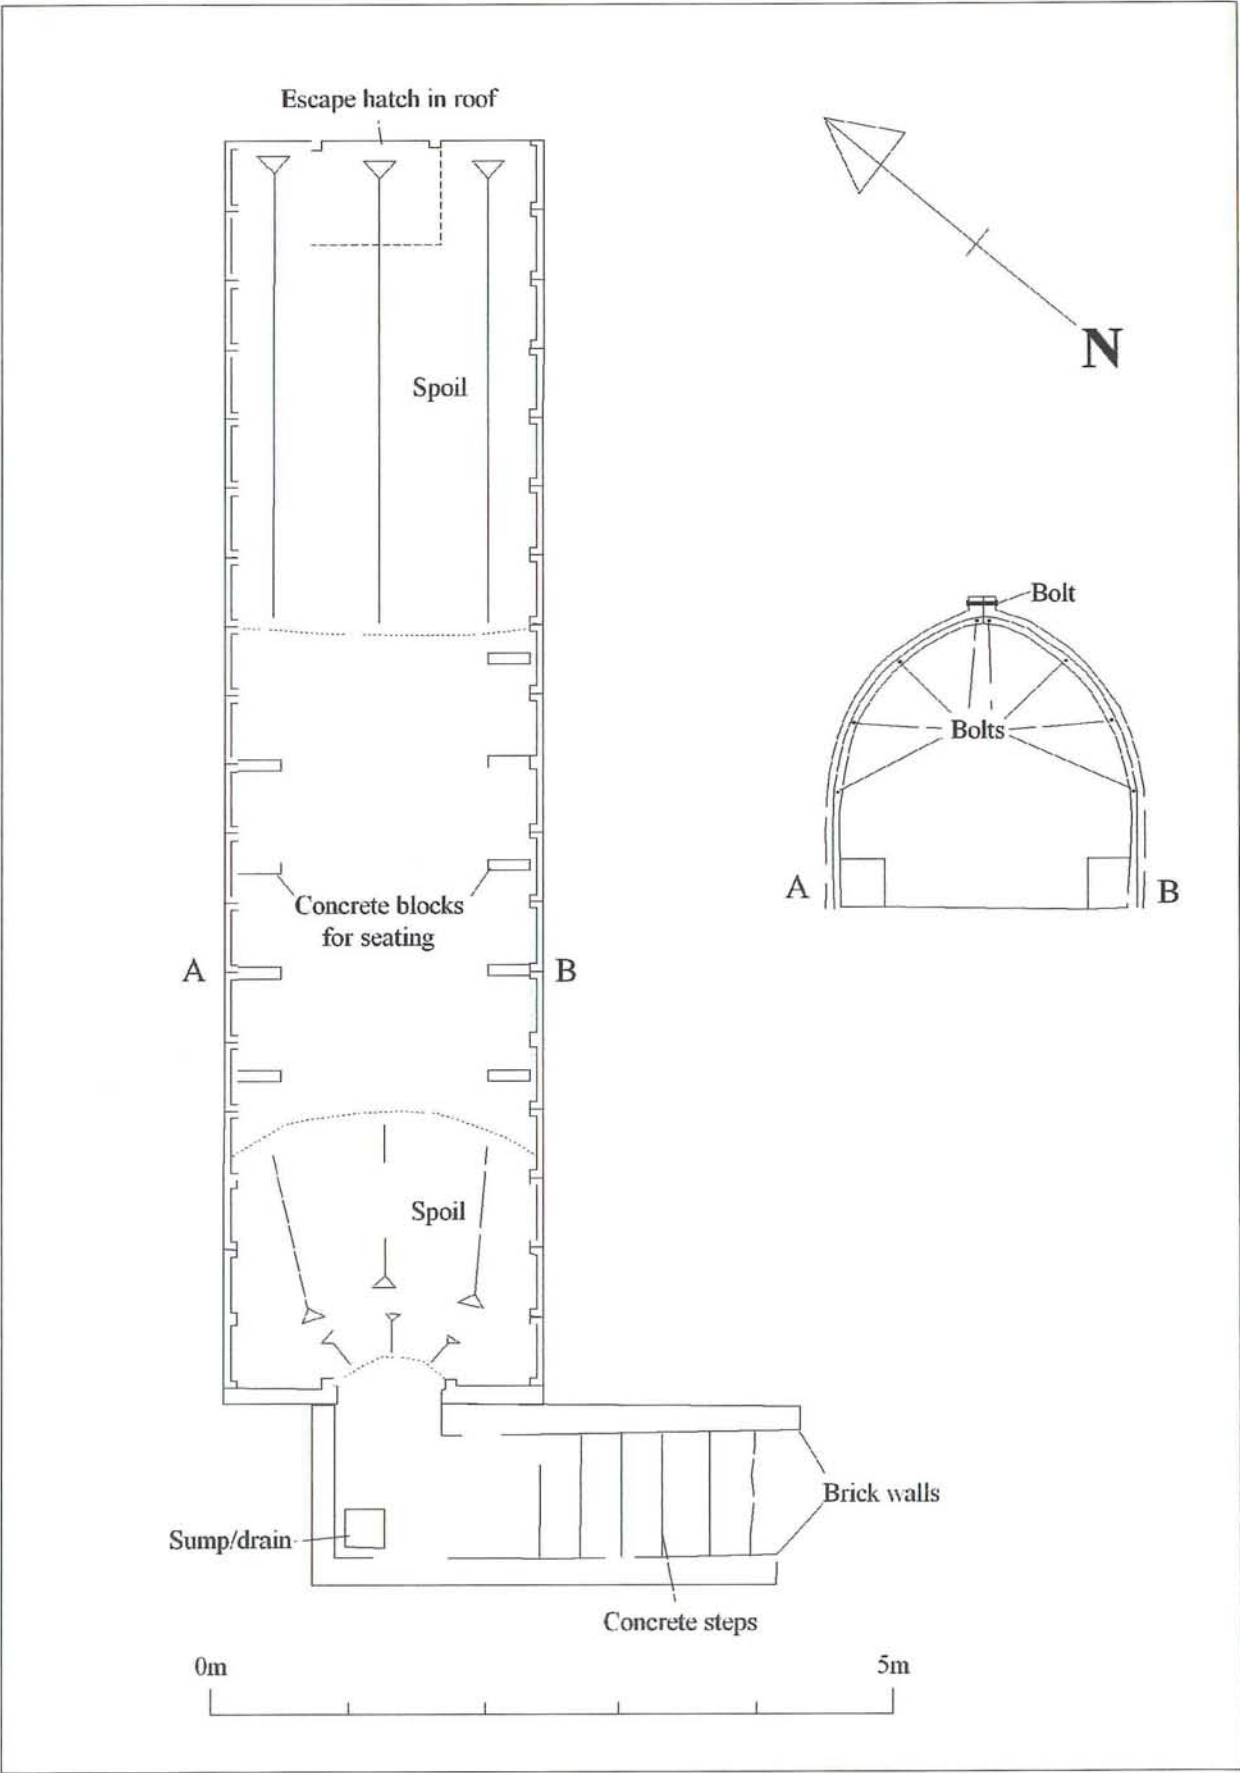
Plan and cross-section of the 'Stanton' air raid shelter at SJ 3590952925
